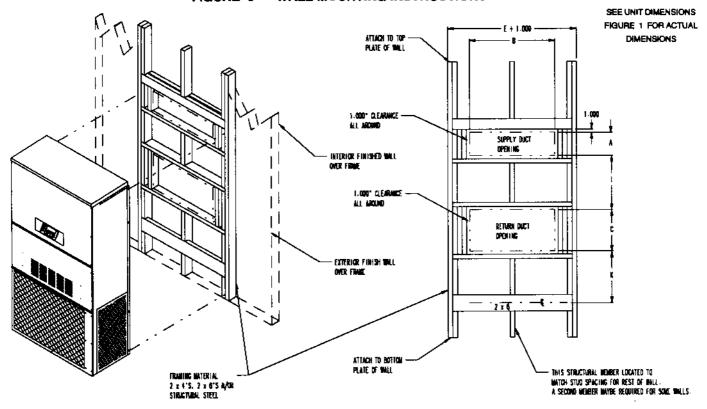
WALL MOUNTING INSTRUCTIONS
